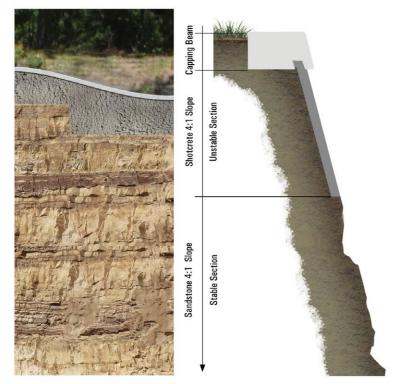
Typical Cutting Treatment Section and Elevation of Shotcrete with Capping Beam and Sandstone Rock
